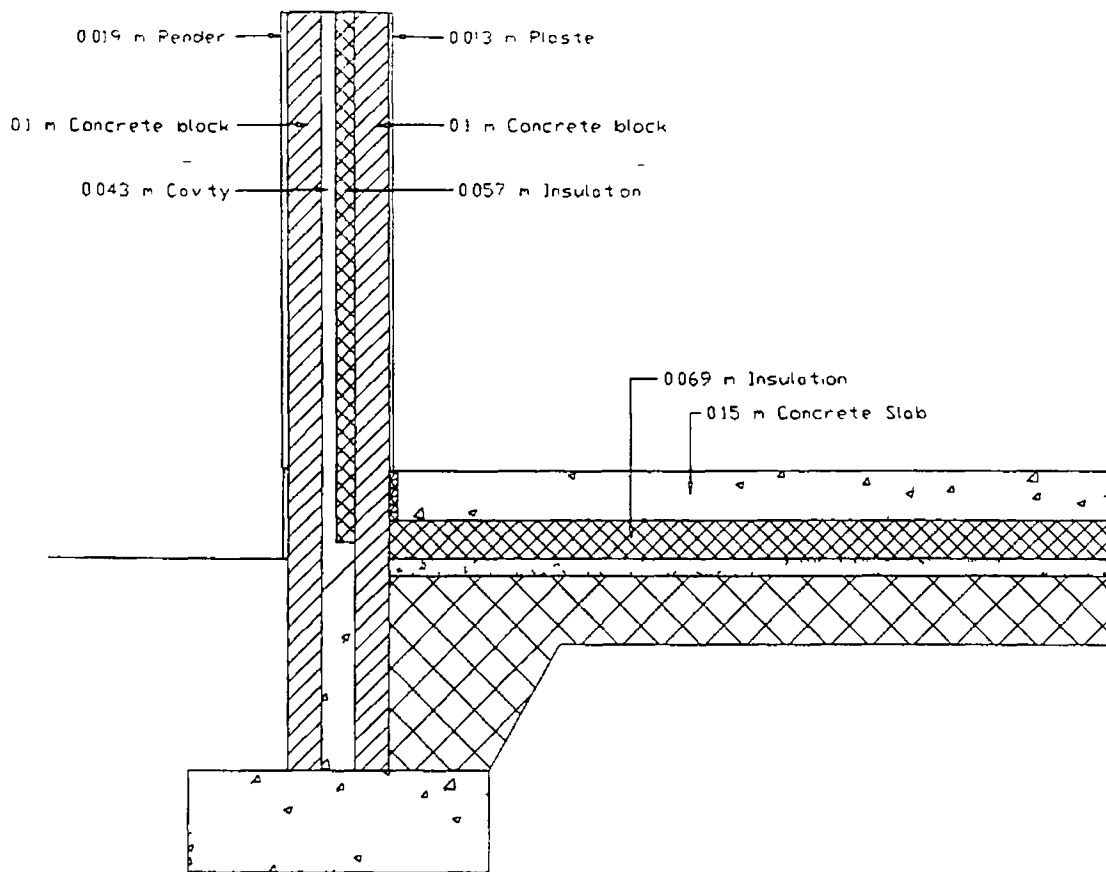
1.2 ANSYS Representation of Foundation, External Wall and Ground Floor
